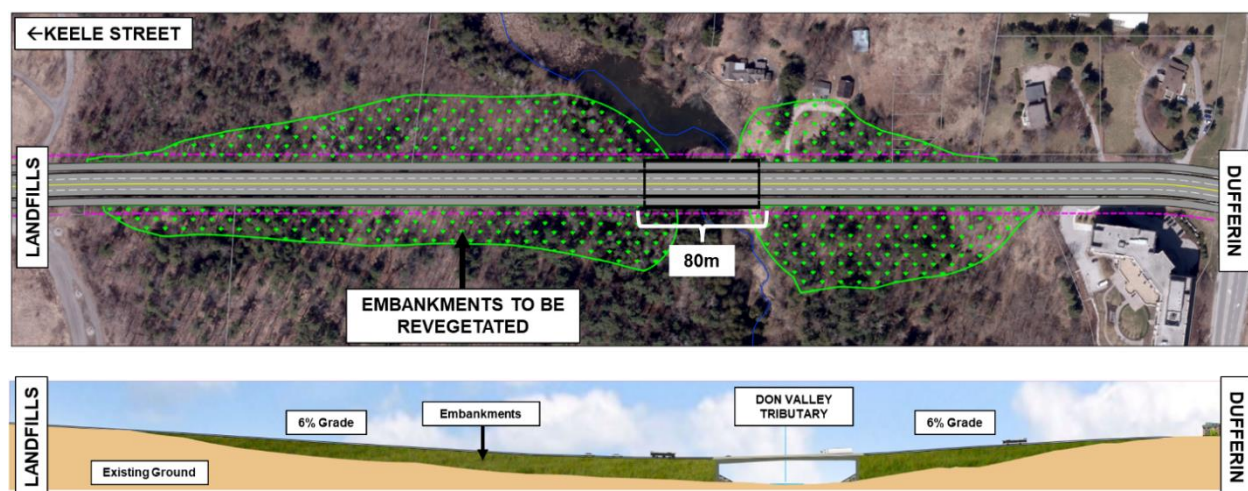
Section 3, Alternative 1: Single Span Bridge
